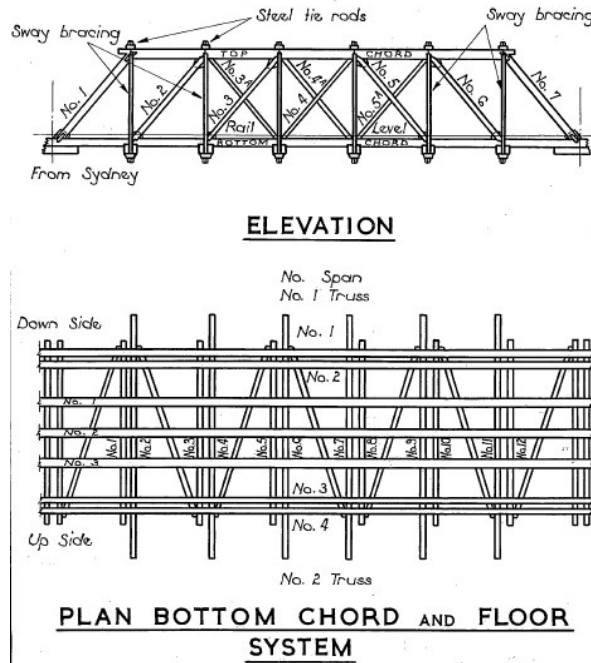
Plan of “NSW Government Railways, Standard Type 60ft timber truss bridge”, Railcorp NSW Archives.
